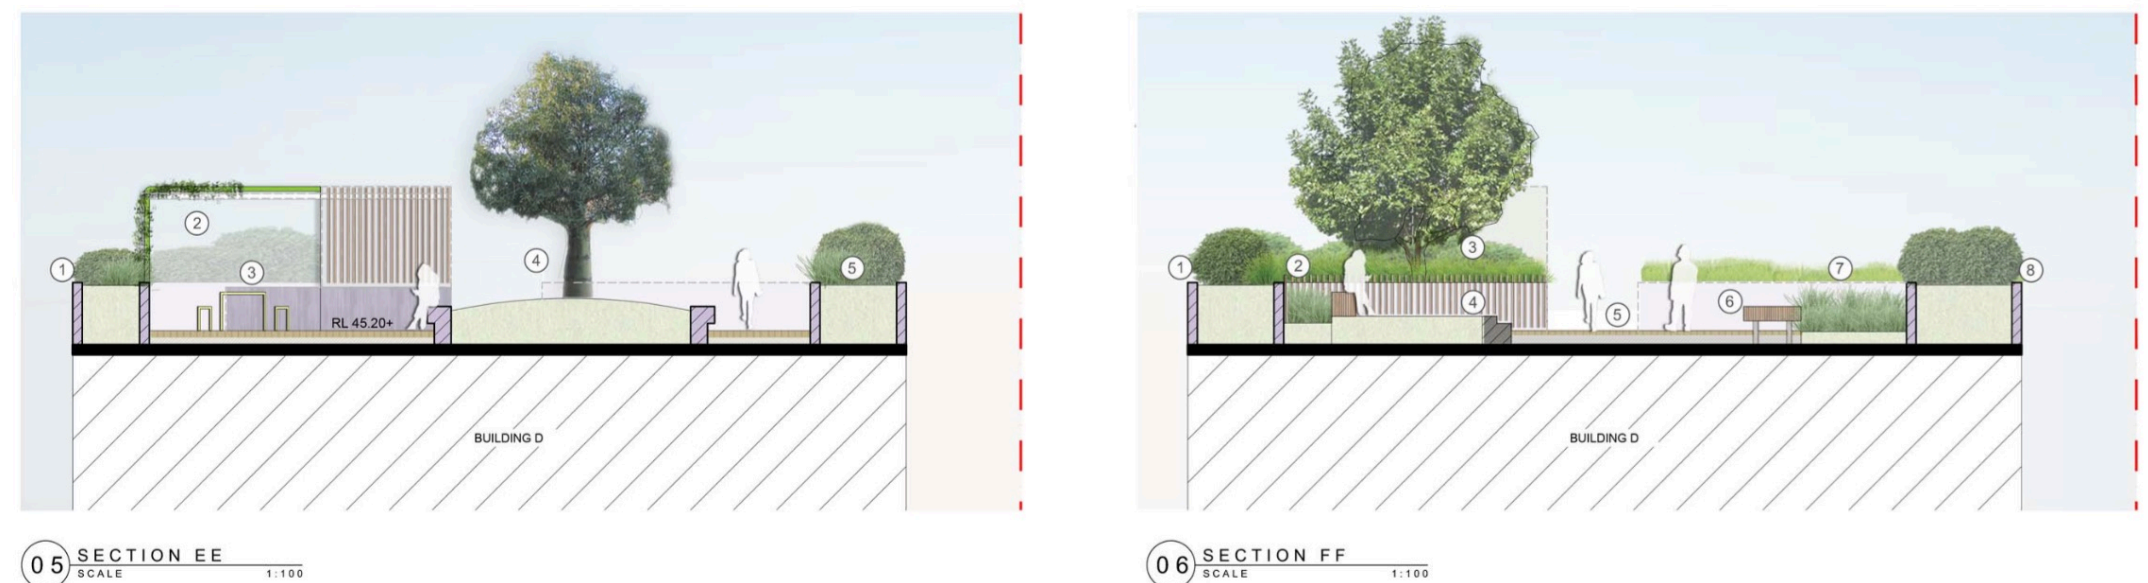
Extract landscape sections illustrating arrangements for new communal open space upon the rooftop of building D.
